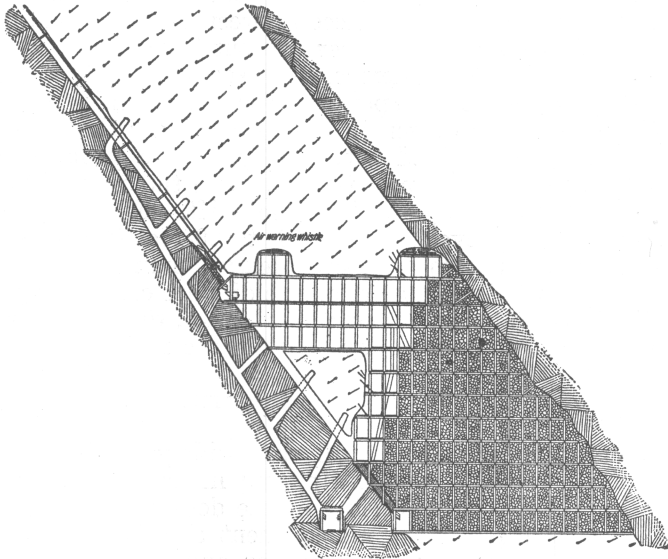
Cross-section showing stope development by footwall raise, Bunker Hill & Sullivan mine.
